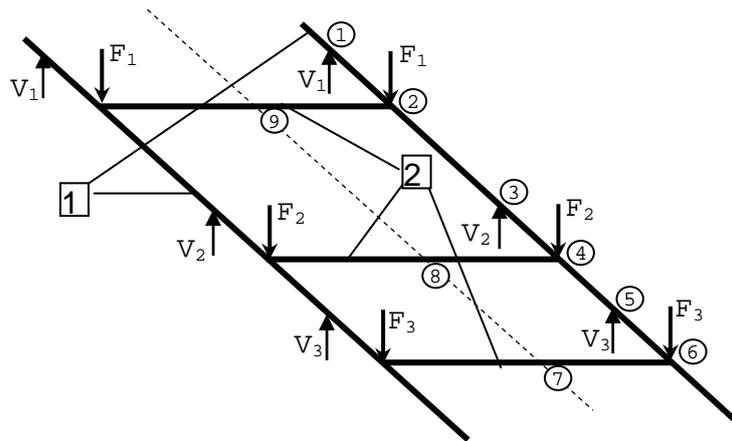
The geometry and loading scheme of the metallic structure: 1- longitudinal beams, 2- transversal beams.
